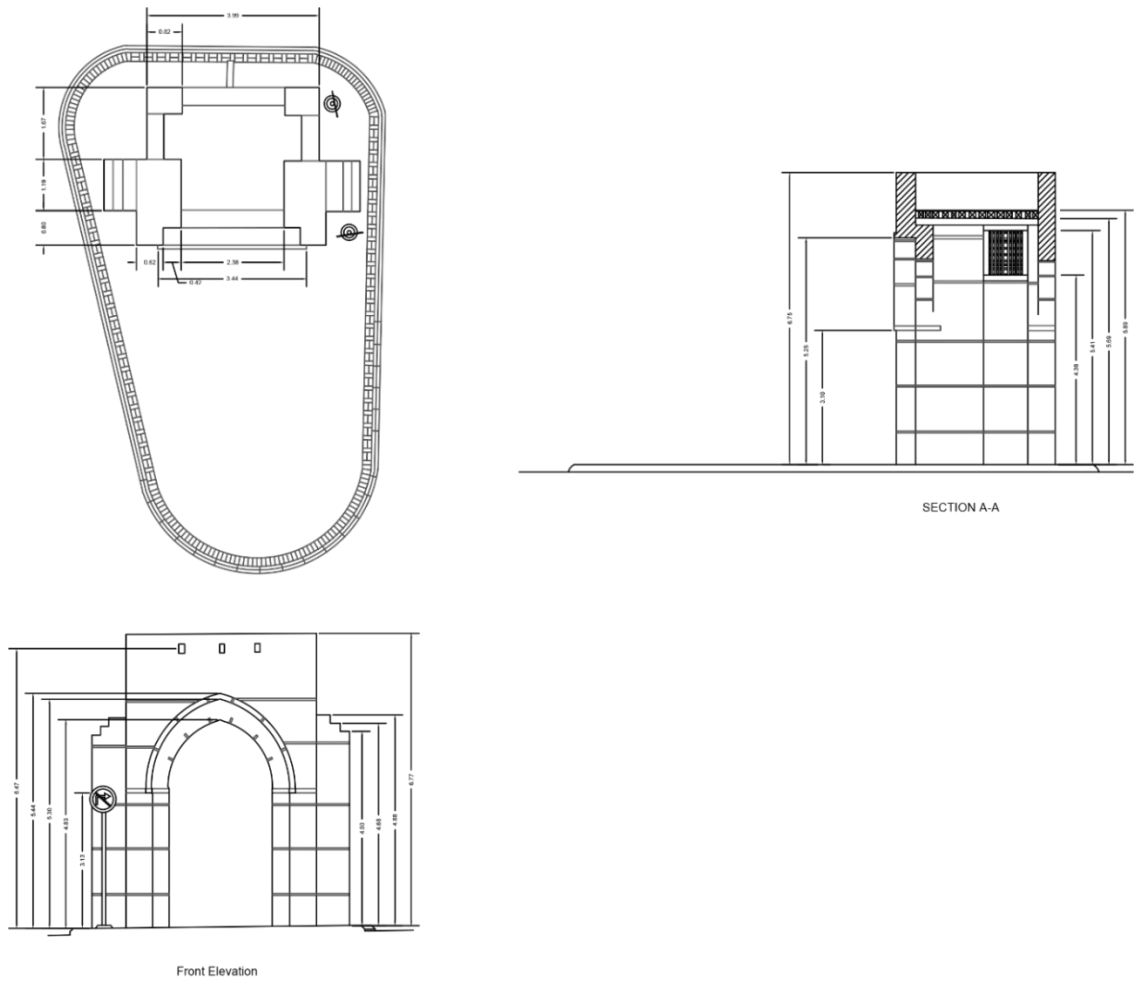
The Sharif Gate's 2D AutoCAD plans, elevations, and sections.
